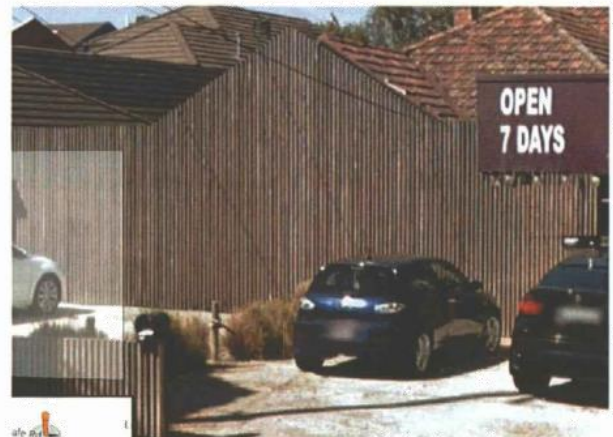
PHOTO EXAMPLE OF HARDWOOD VERTICAL TIMBER BATTEN WALL NOT IN SCALE
